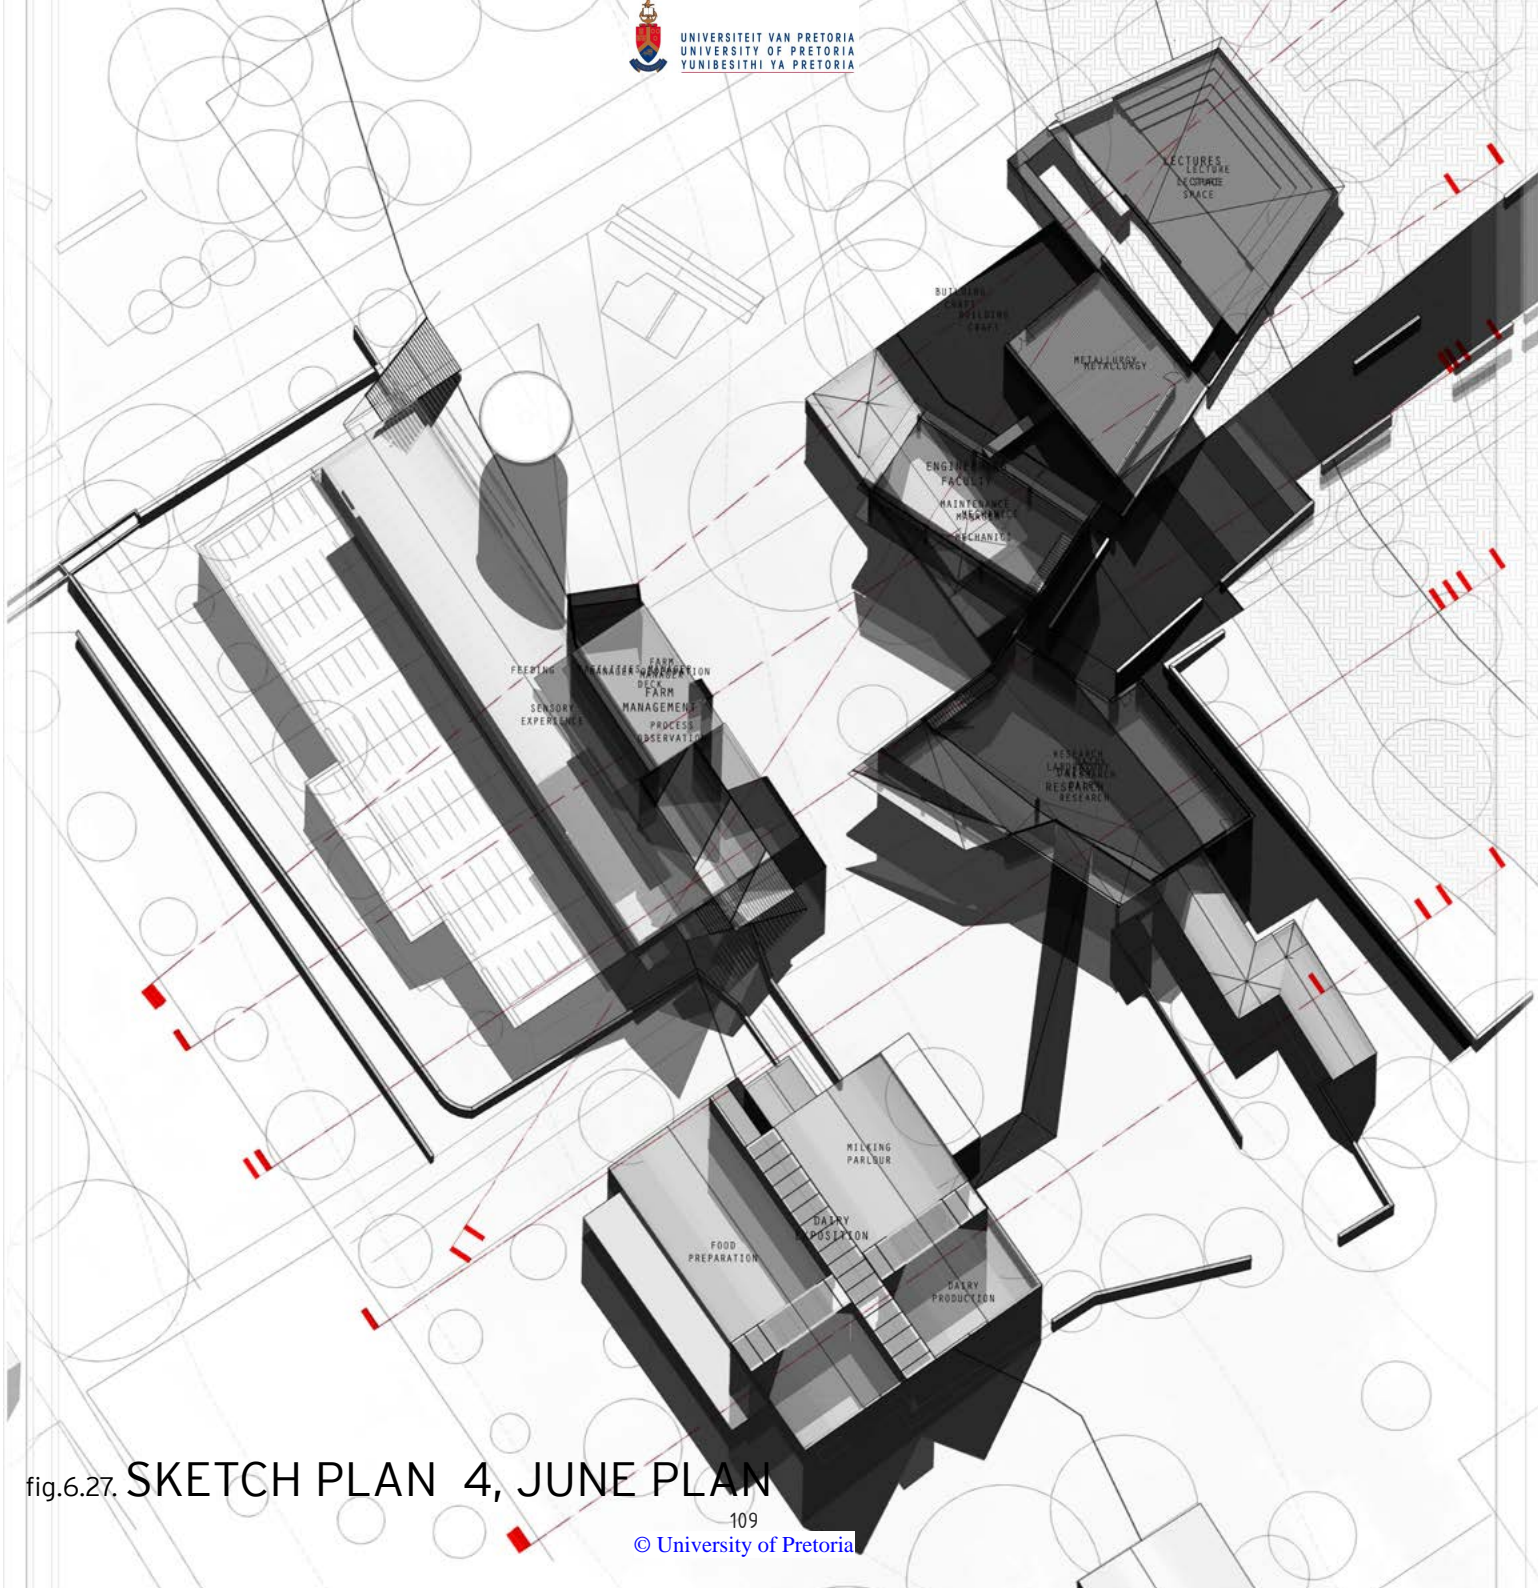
SKETCH PLAN 4, JUNE PLAN
